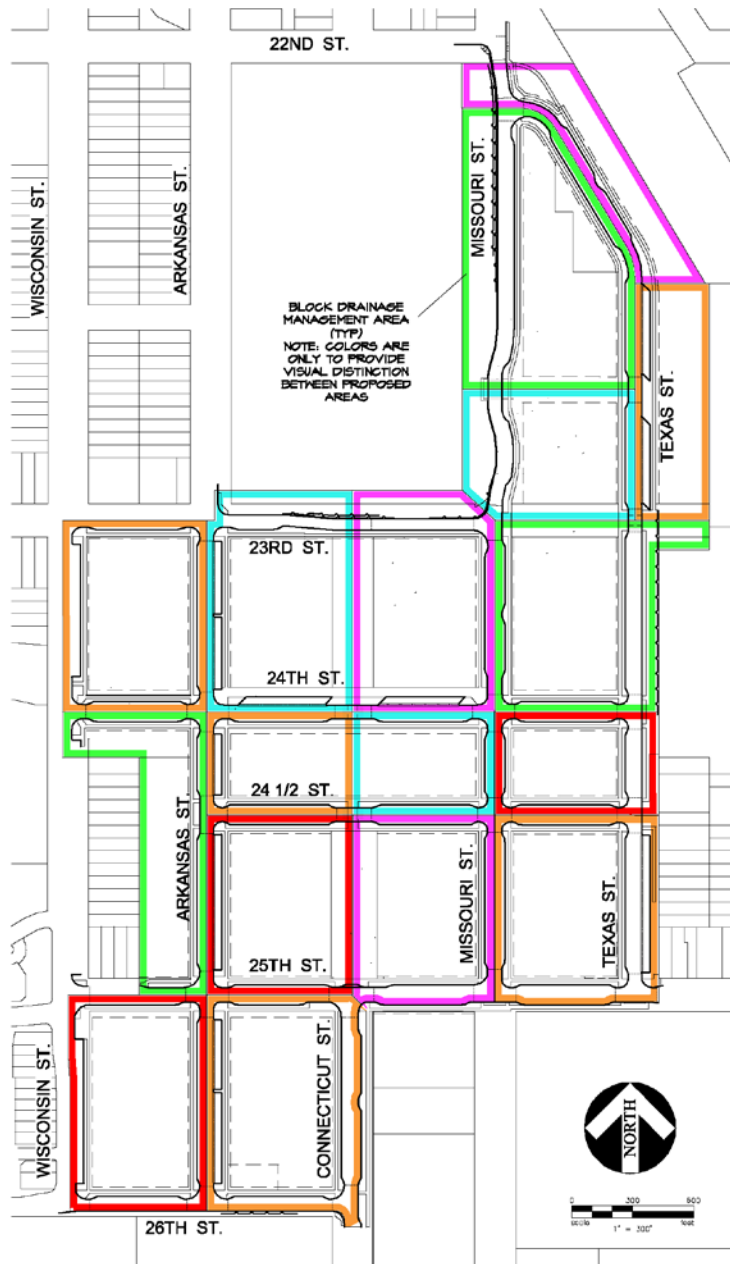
CONCEPTUAL JOINT TRENCH PLAN
